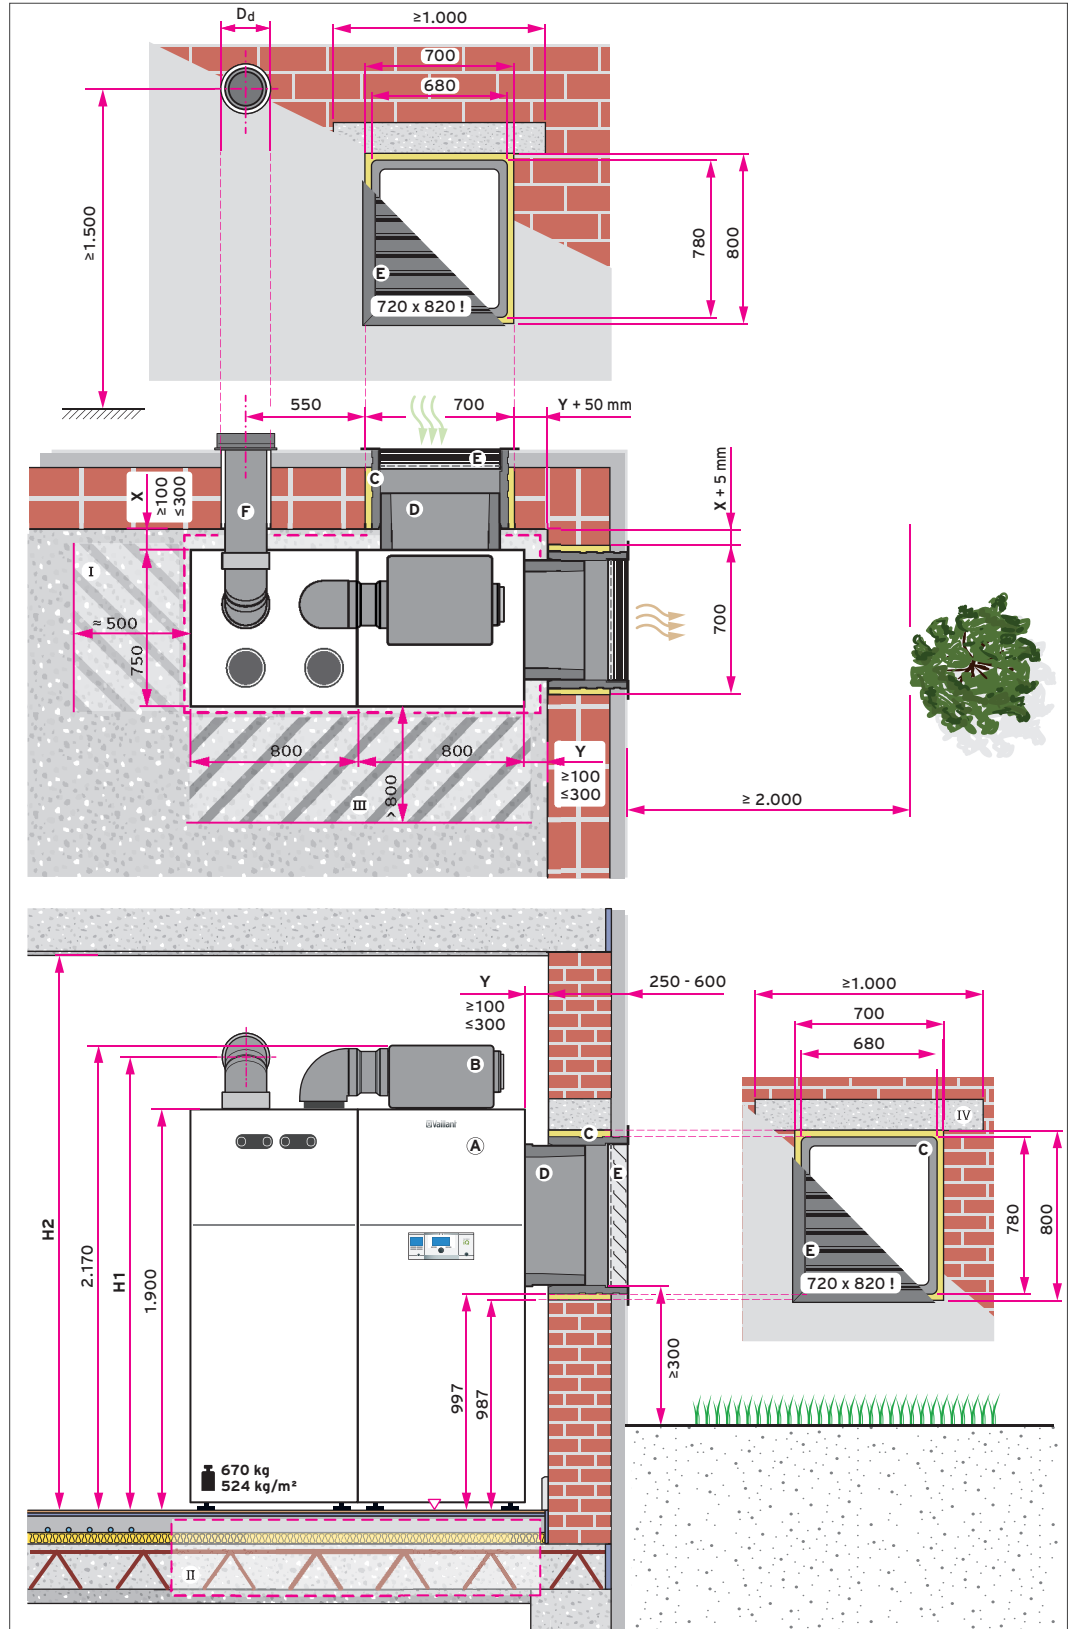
recoCOMPACT installation situation, ground floor - right-hand installation in the corner of a room
